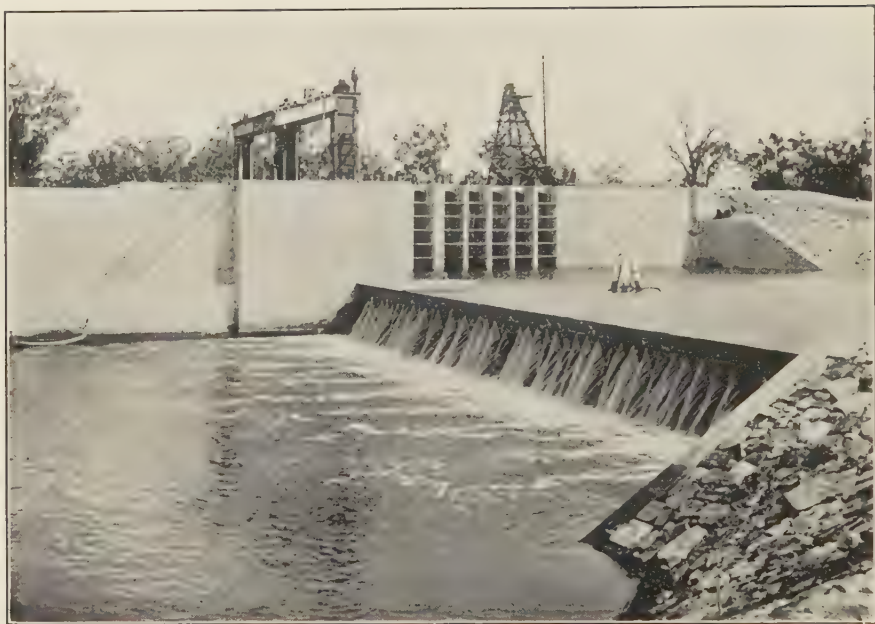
FIG. C.—Collapsible diversion weir on Murrumbidgee River, New South Wales, Australia.
